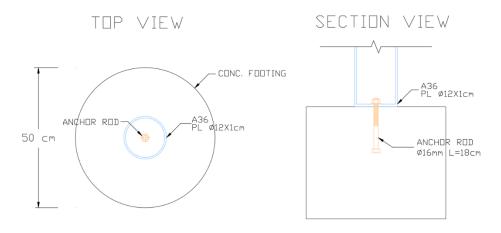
Final Dimensions of the Base Plate and Anchor Rod Components
